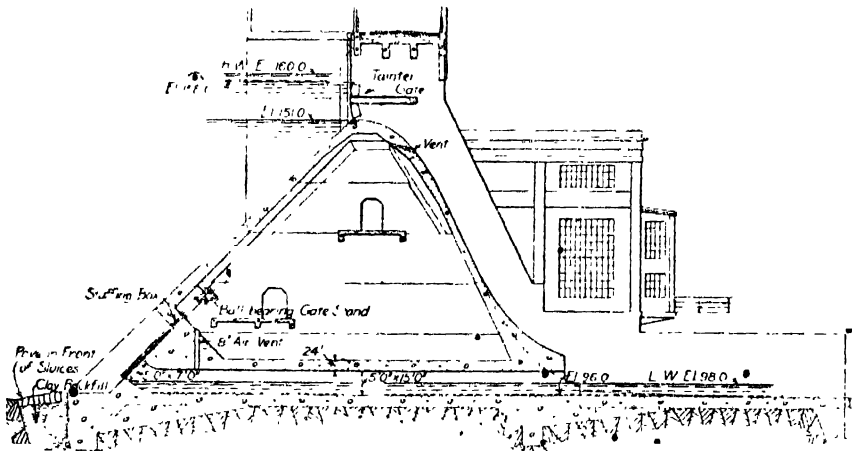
Section of Ferro-concrete Dam, showing Spillway
